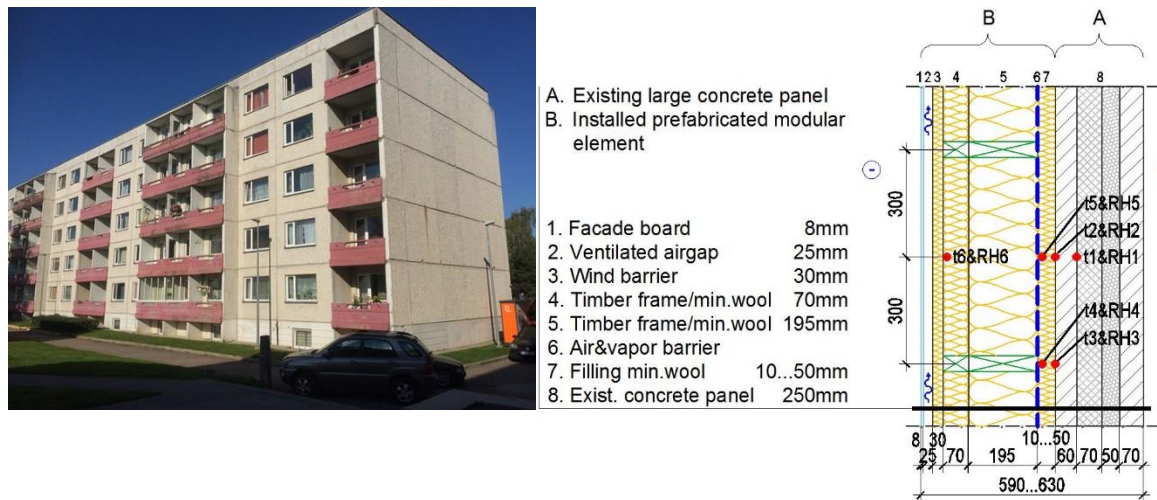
Overview of the existing building before renovation (left) and solution (designed by architecture and design bureau Sirkel&Mall OÜ) of concrete large panel covered with prefabricated modular element (right).
